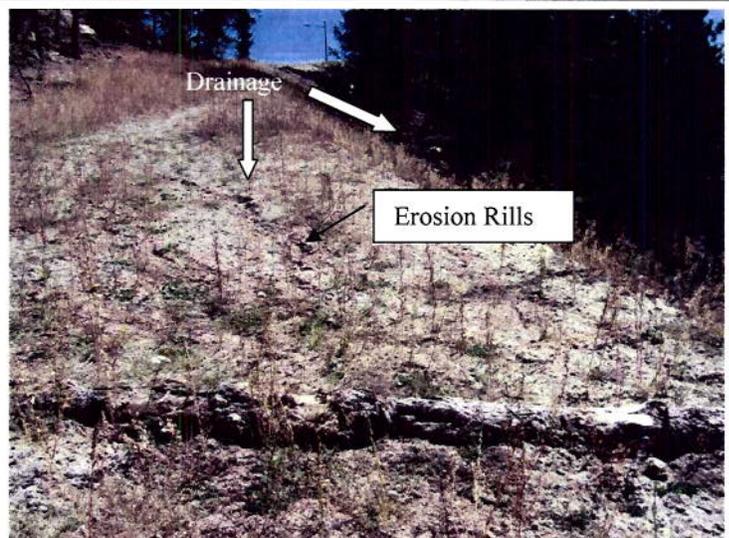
Linear disturbance located north of the Avenue to the All Stars, east of Richman Street and west of the existing private gravel driveway (identified in photo 7)
